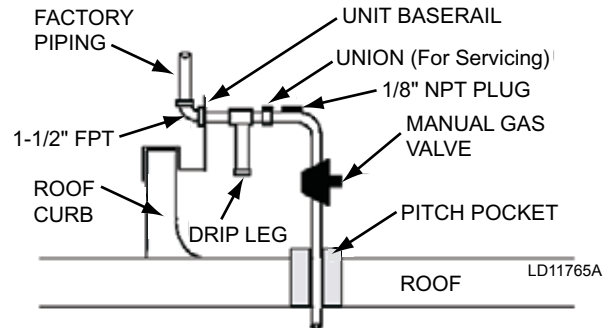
TYPICAL GAS PIPING CONNECTION
